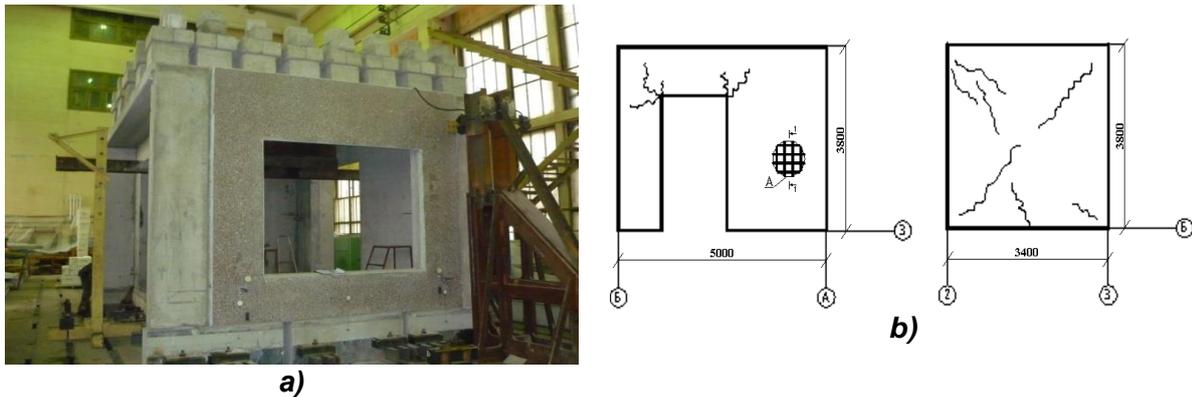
General view for fragment of 9-storey large-panel building (a) and scheme of cracks in panels walls (b) at alternate static load testing.
